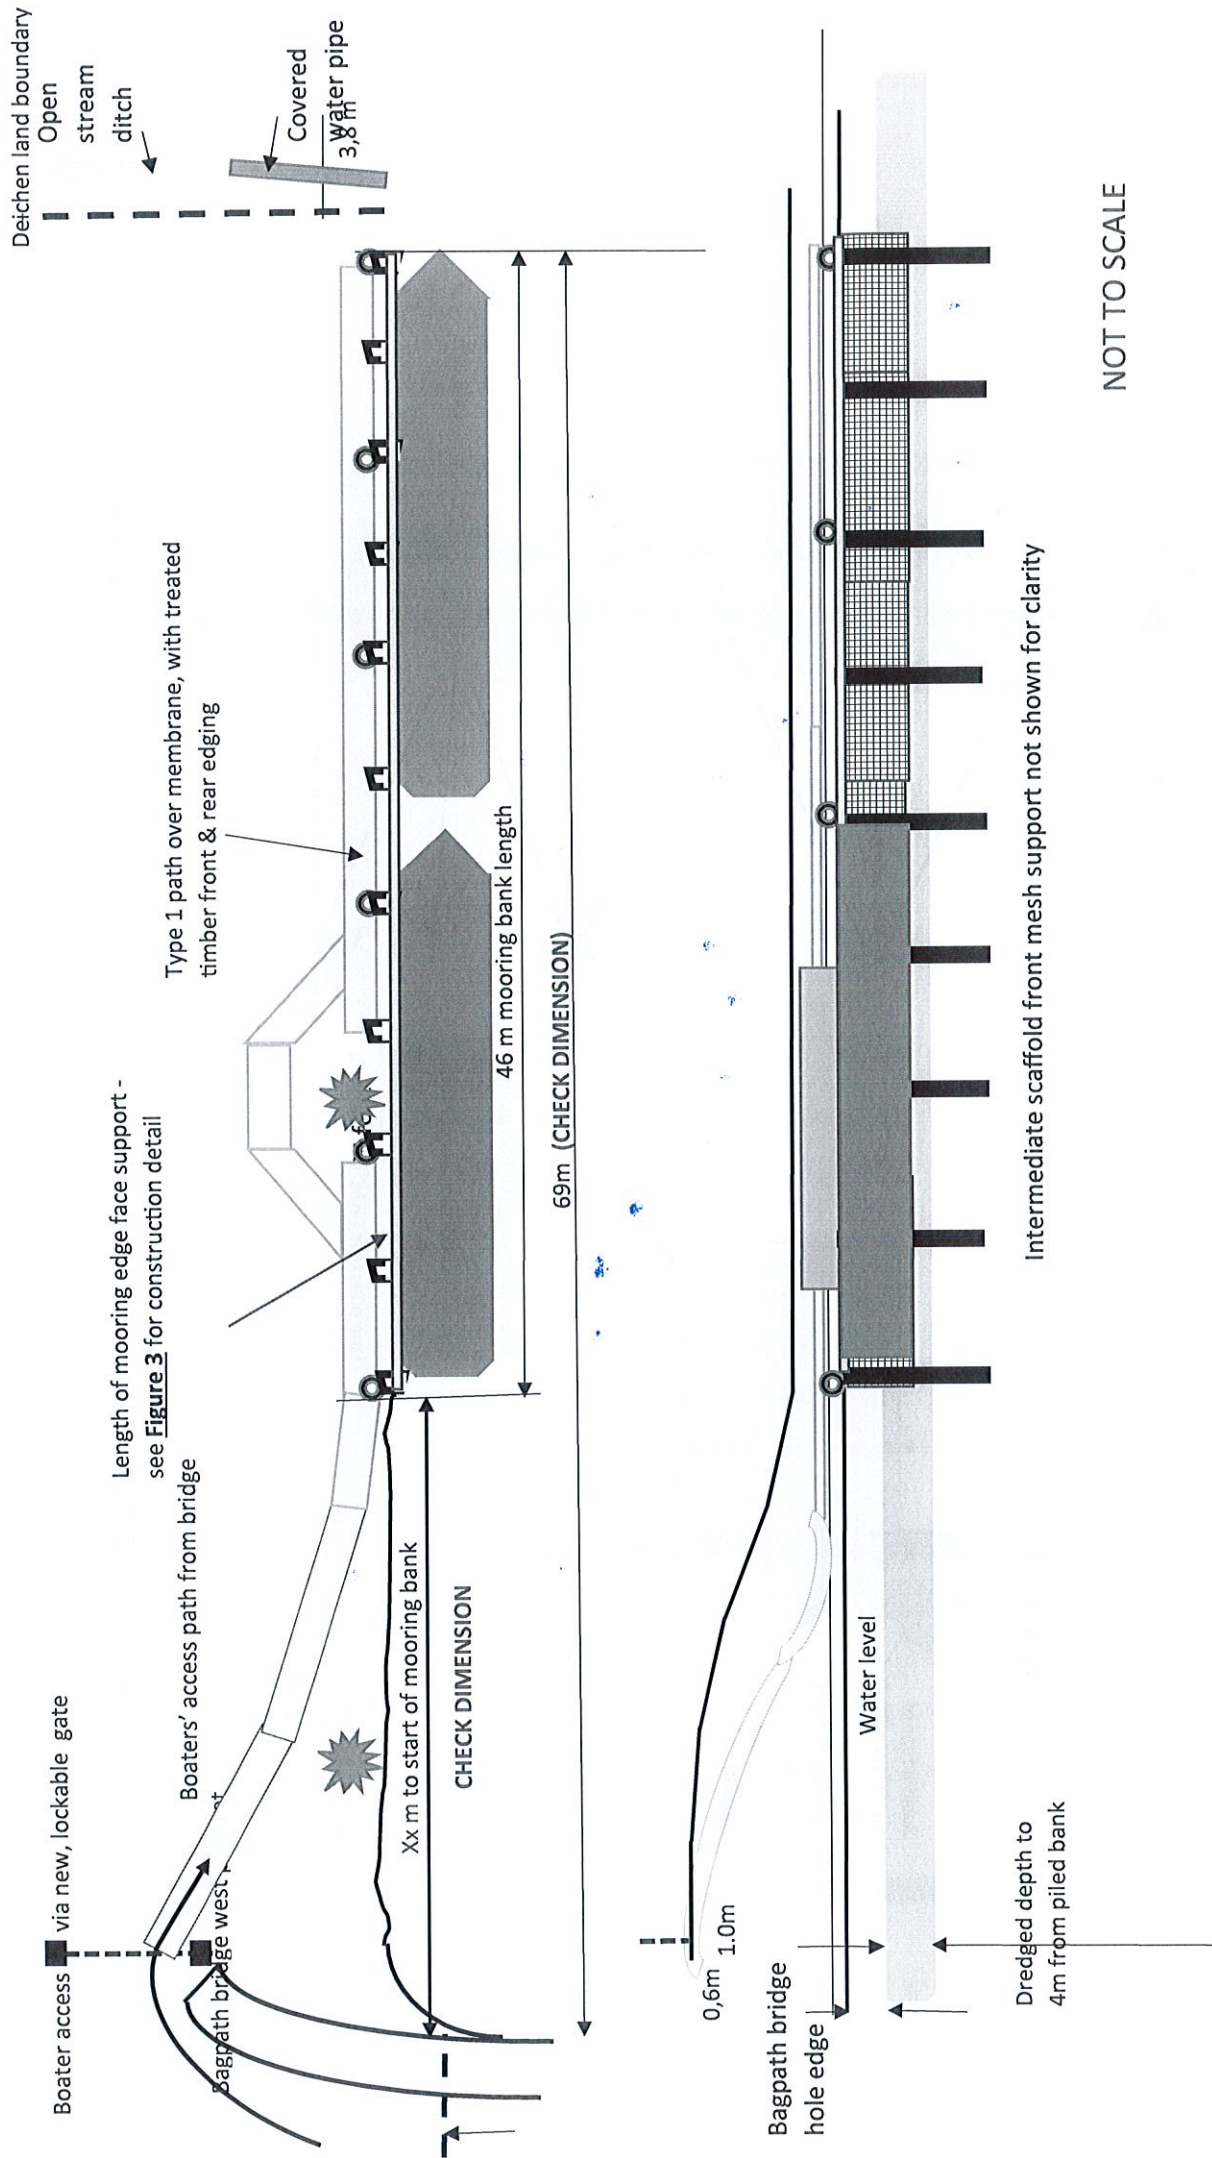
Site Plan - 2 new wide-beam boat moorings just west of Bagpath bridge, Thrupp
